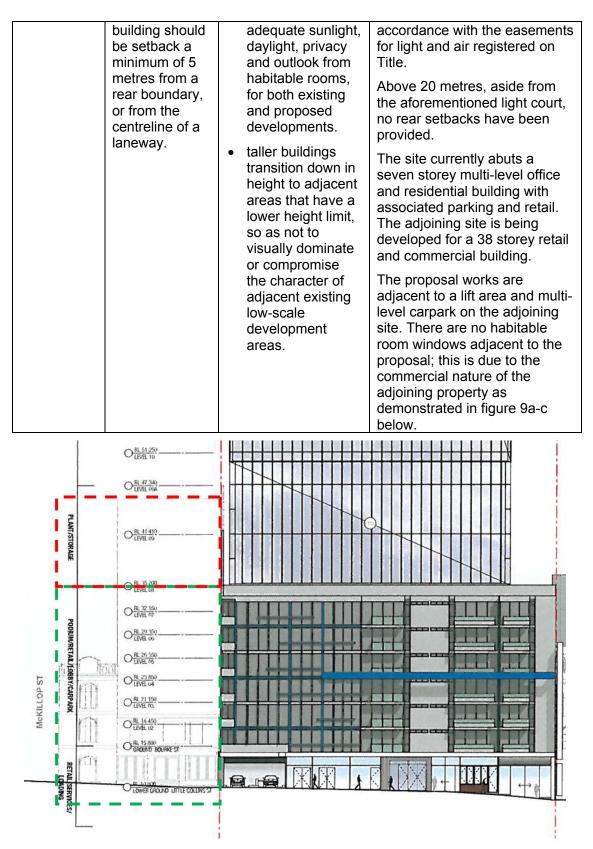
Exerpt of souther n elevation of endor sed plans for 405 Bourke Street. Indictative height of existing building shown in green, and indicative location of proposed development shown in red.
